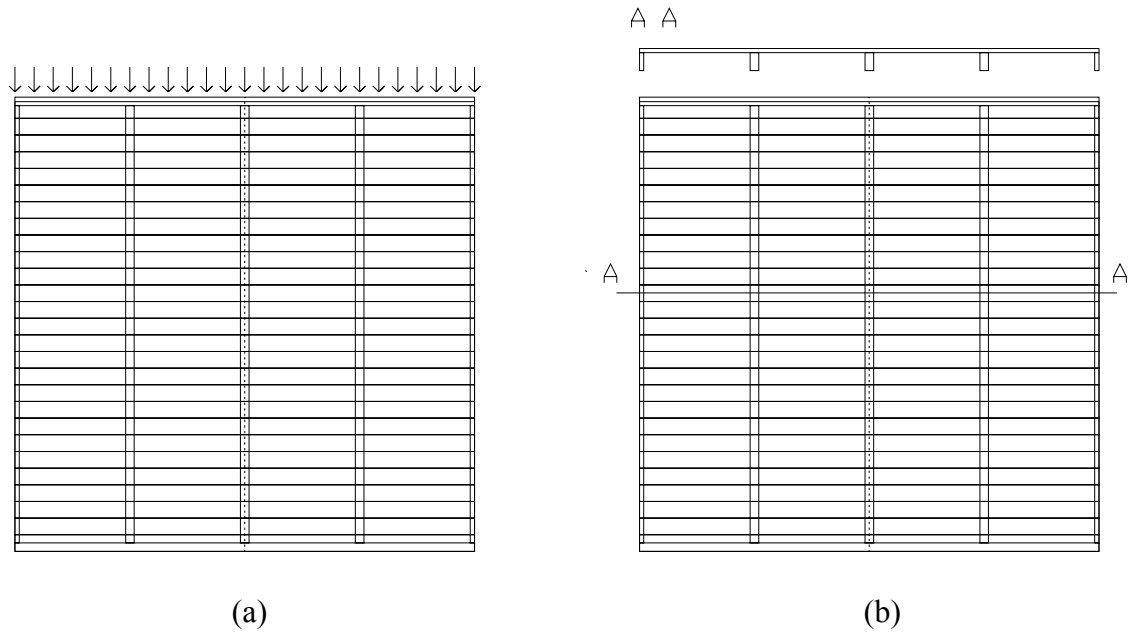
(a) Wall with load applied (b) Wall with cross-section
